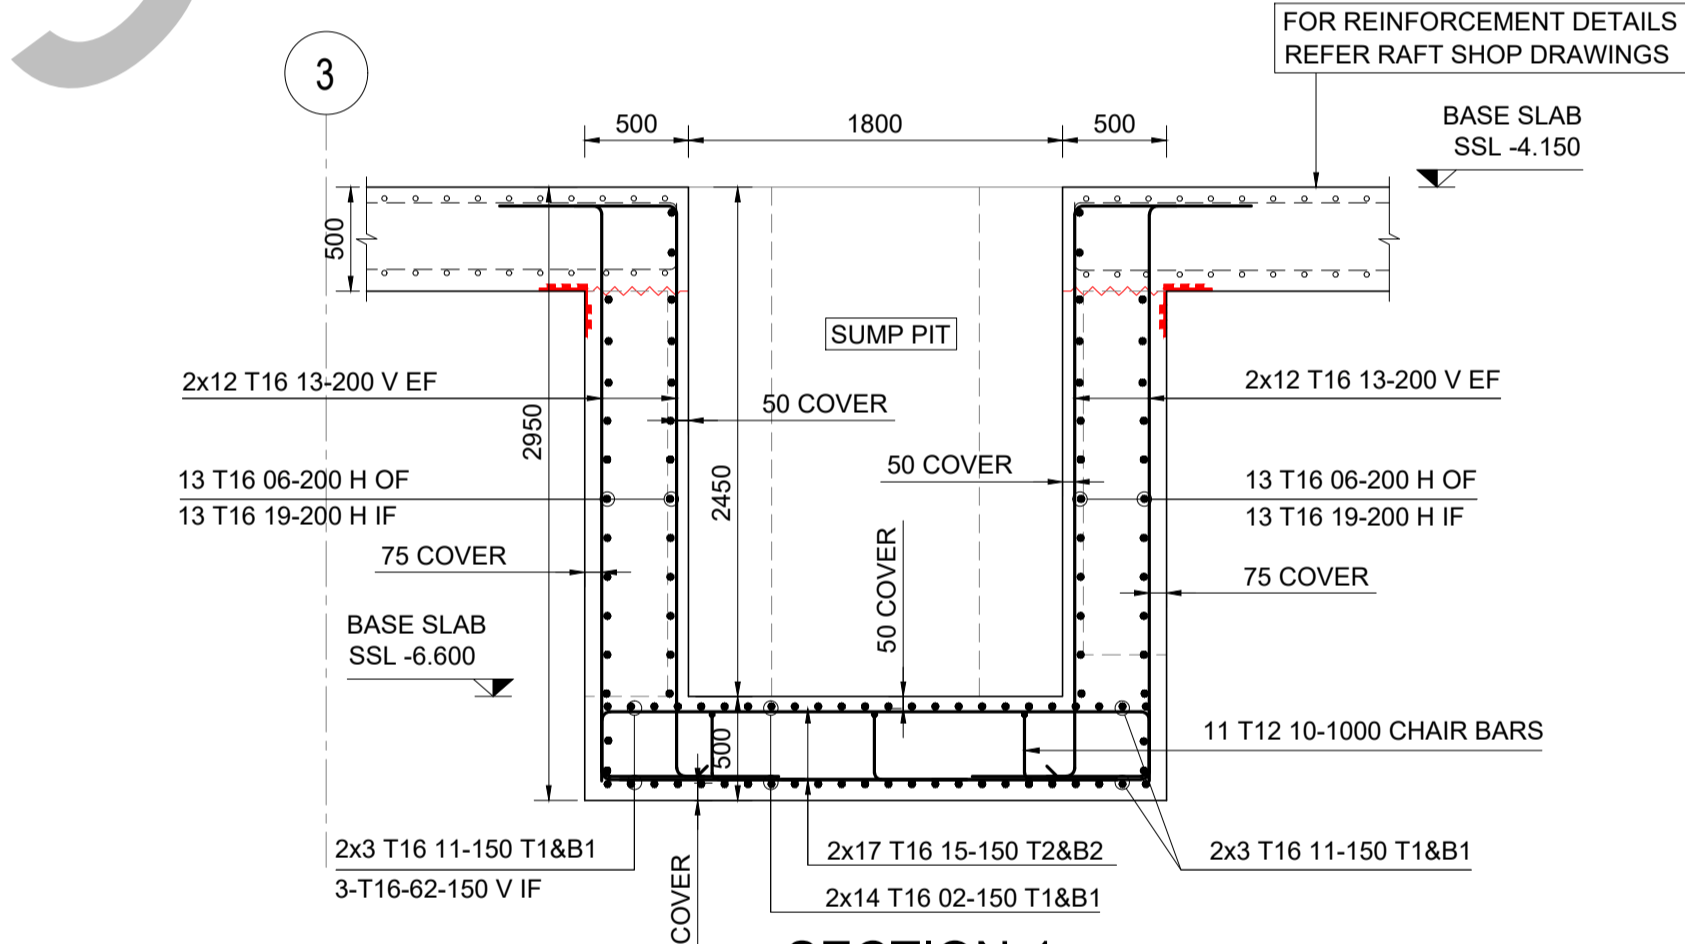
DETAIL-D SUMP PIT WALL REINFORCEMENT DETAILS
